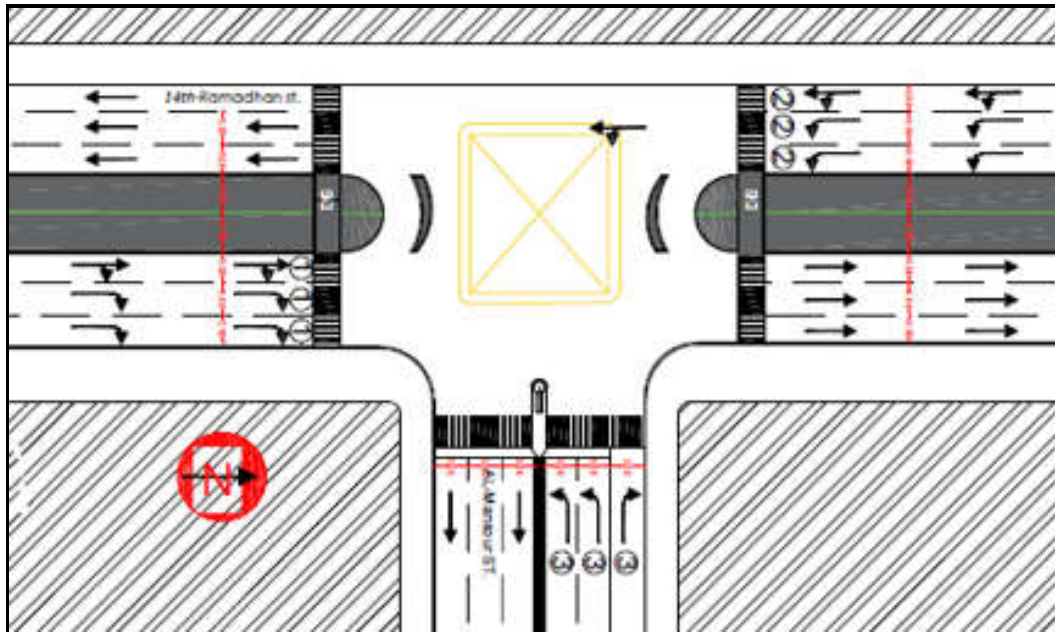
Geometric Layout of the Second Re-Design Proposal
